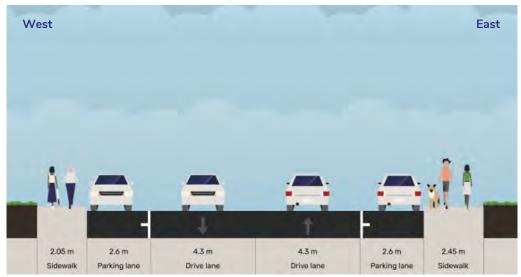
Existing 4th Street Cross-Section Between A Avenue and Front Street
